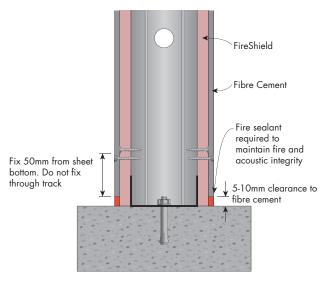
FireShield and Fibre Cement Wall Base Non-load bearing wall
